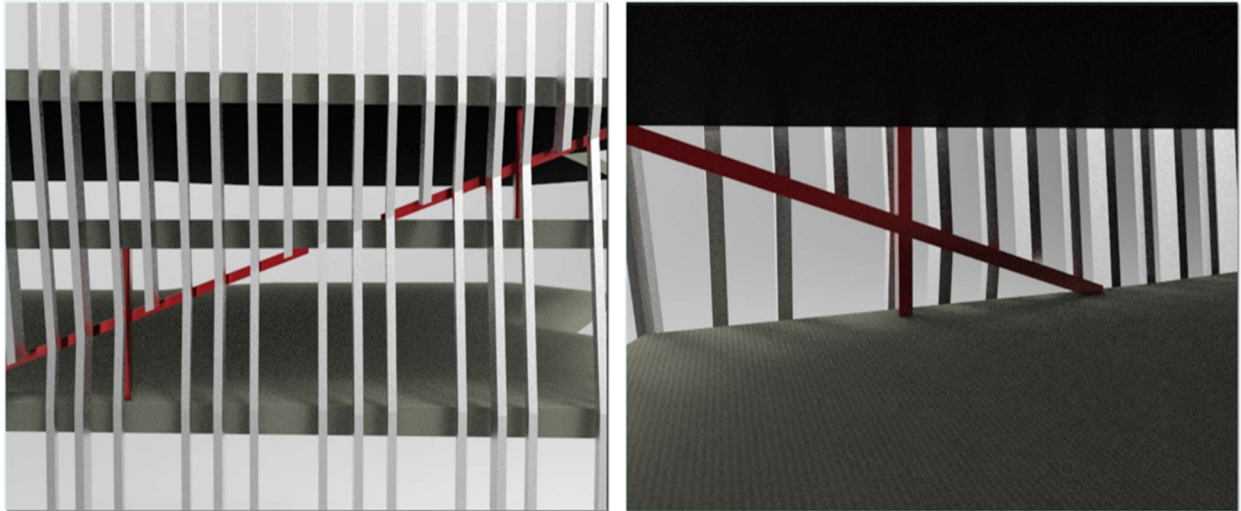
Steel beam supported unitized curtain wall design option 3D rendering
